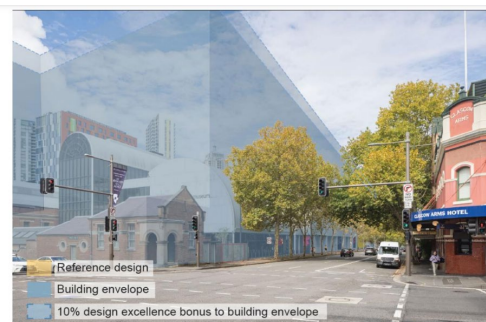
View 1: Harris Street and William Henry Street – proposed view
